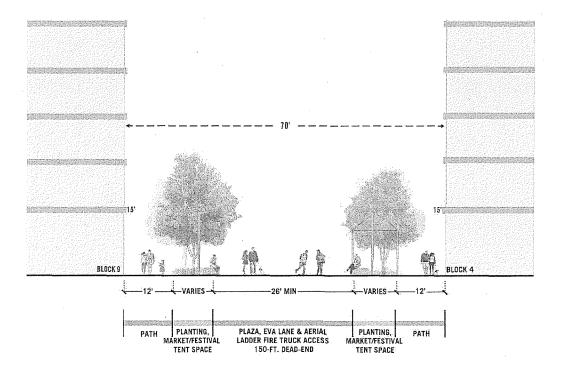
Humboldt Street Plaza: Concept Section Looking West
